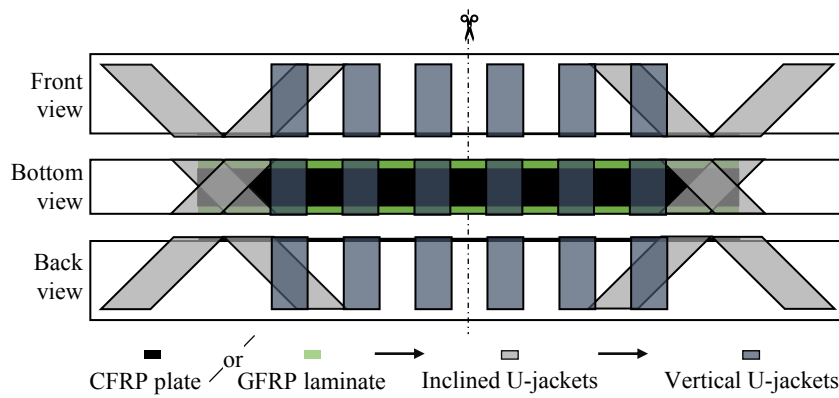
Bonded-FRP system for strengthening deteriorated concrete beams without repairing corrosion-damaged concrete cover.
